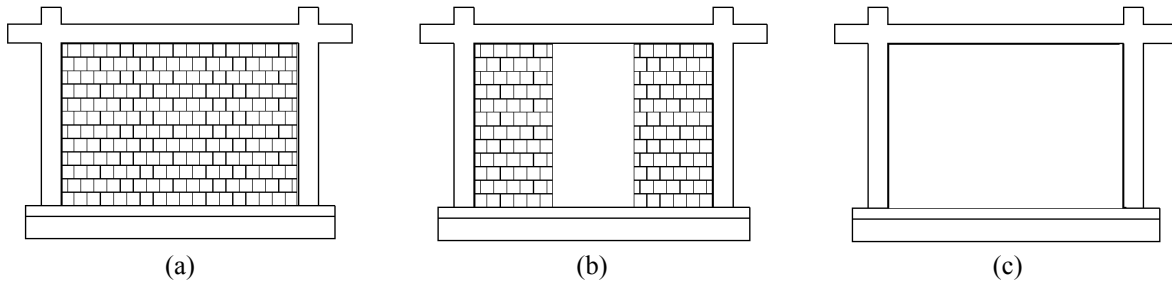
Schematic of the a) full infill panel, b) open infill panel and c) bare frame.
